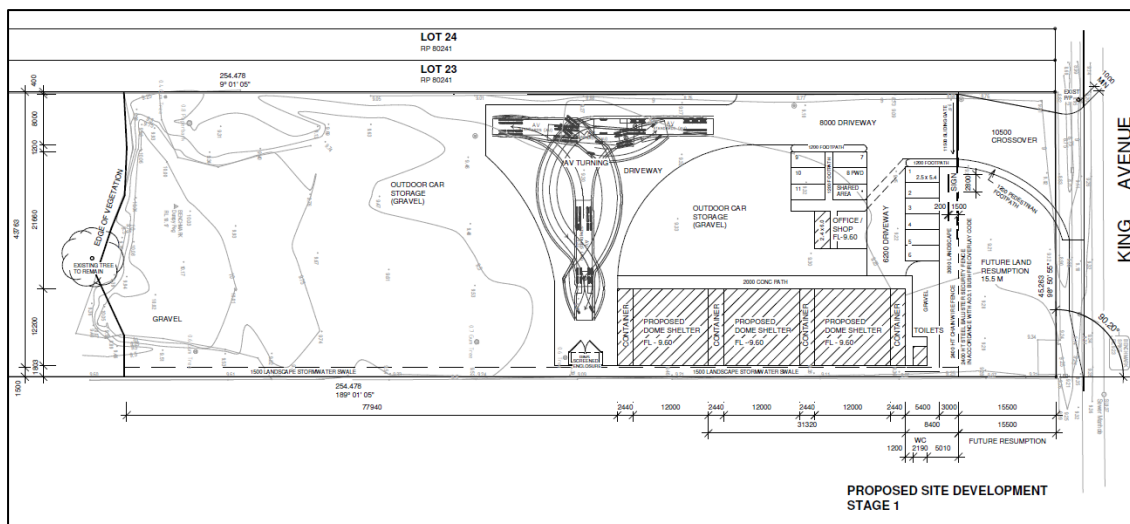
Proposed Stage 1 Site Development Plan – The Design Studio (March 2026)
